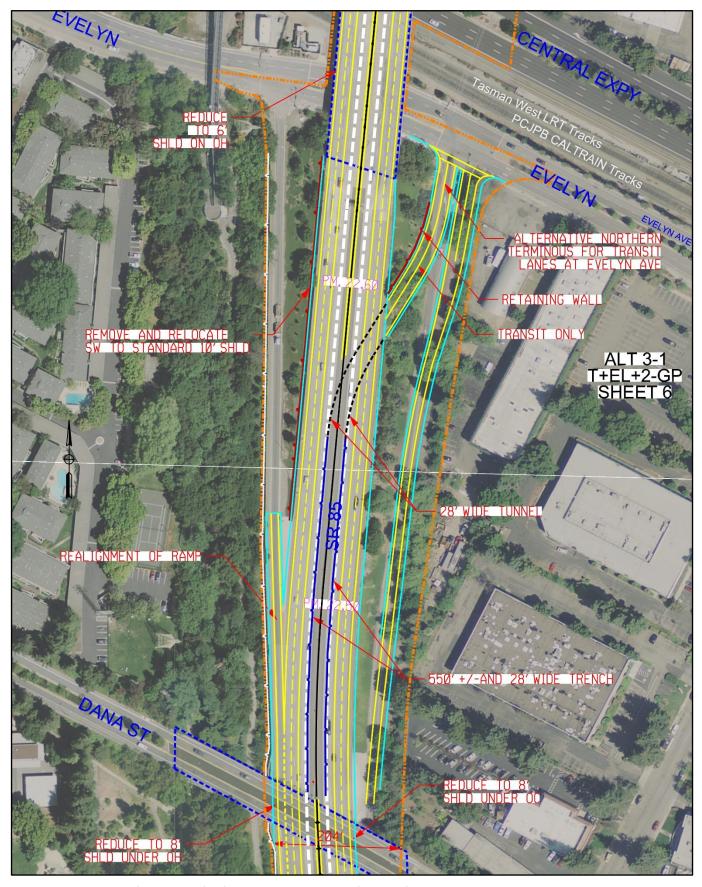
Alternative 3-1 Conceptual Alignment Plan for Direct Connector Drop Ramp to Evelyn Avenue
